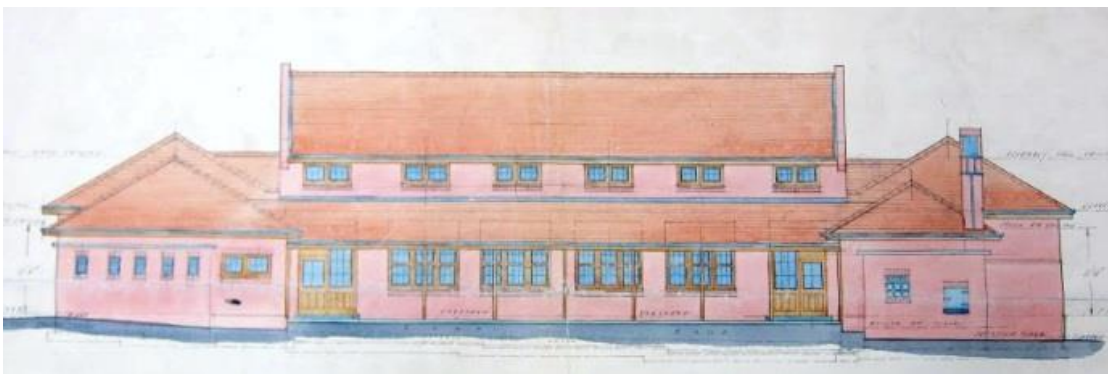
North elevation, 1928 (Source: VPRS3686/P6/3093)
